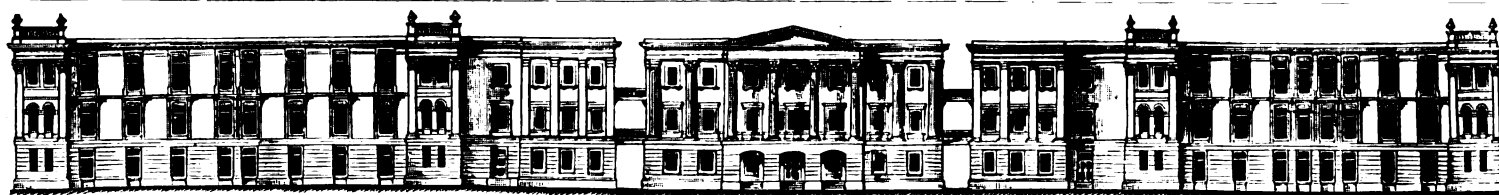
FRONT ELEVATION AS ALTERED.
